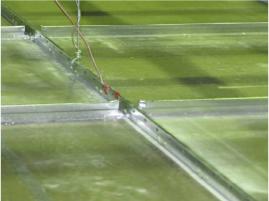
Suspended ceiling system mounted on the test frame prior to experimentation
